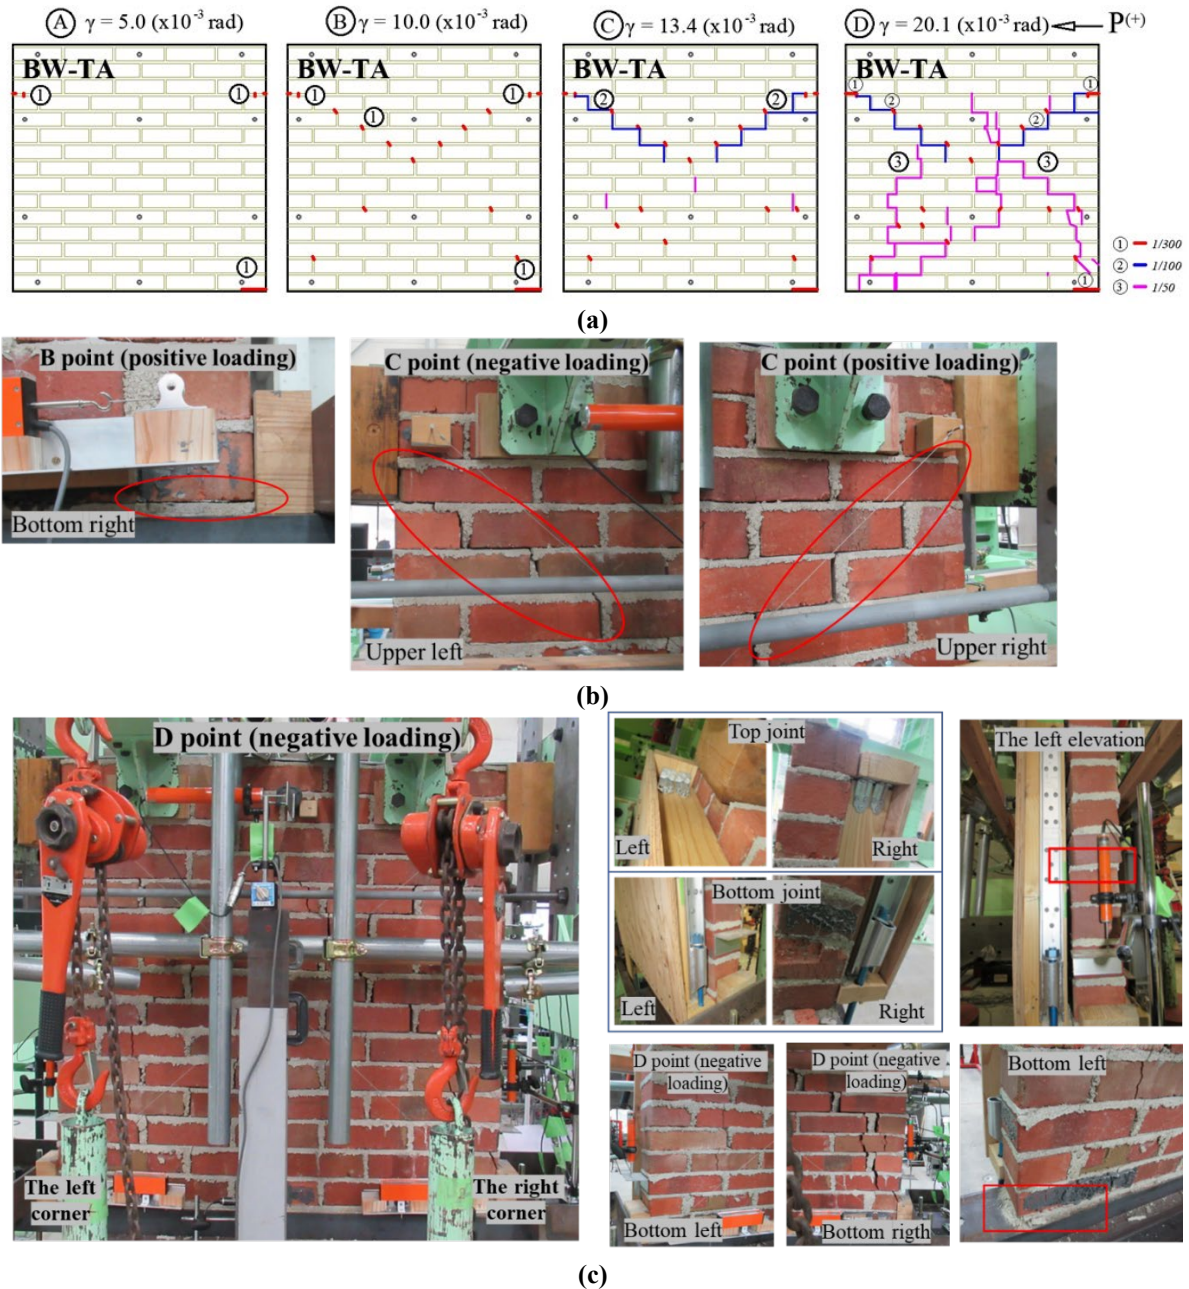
Failure and crack pattern of BW-TA wall. (a) Scheme of crack; (b) Failure photo at “C” point; (c) Failure photo at “D” point.
